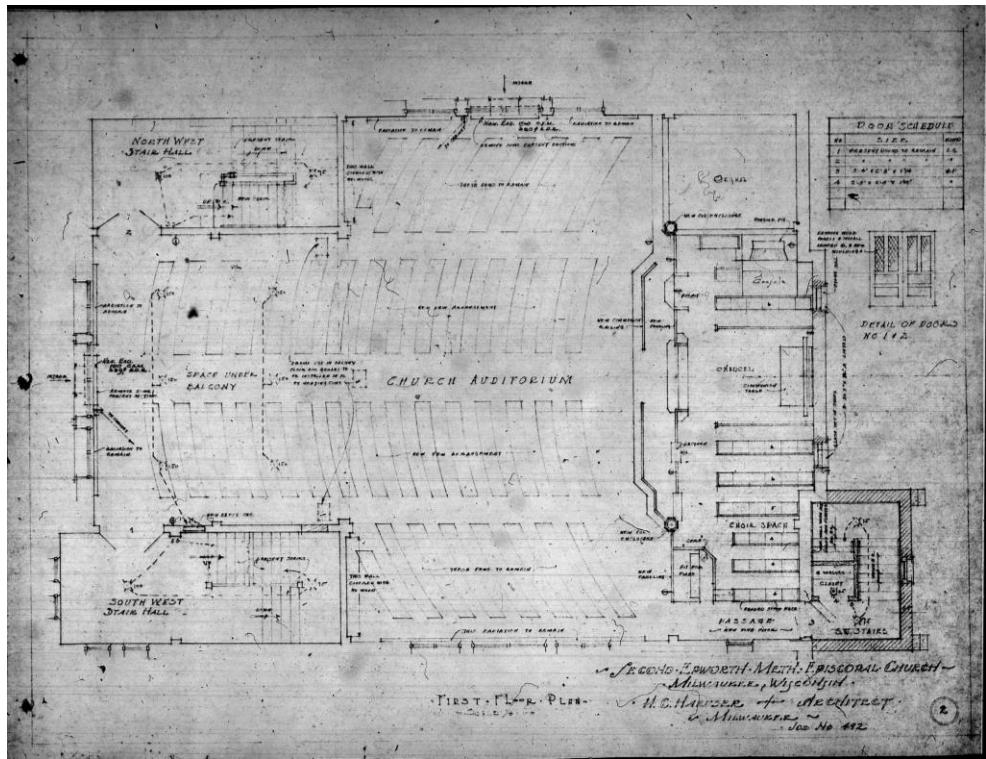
First floor plan drawing of the church by architect H.C. Haeuser, 1939.
